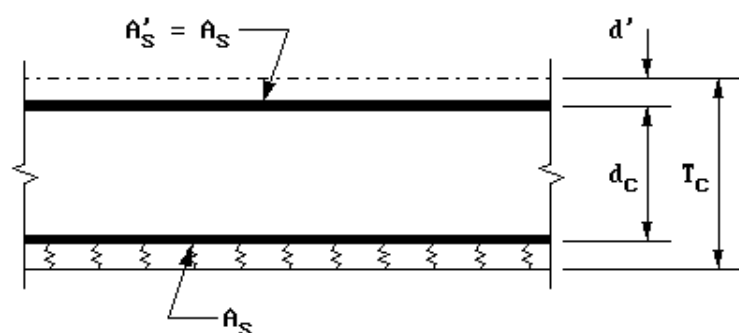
Typical Reinforced Concrete Cross Sections
